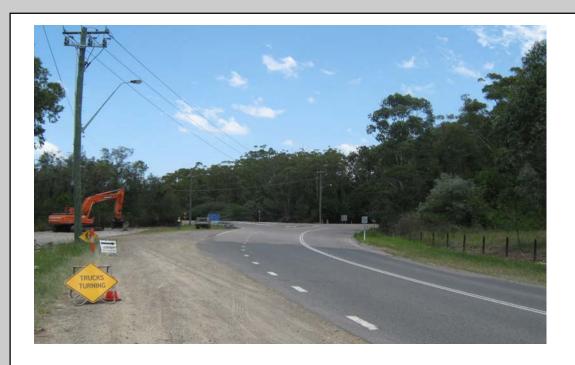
View south/east in Old Punt Road towards T Junction with Smelter northern access road.
